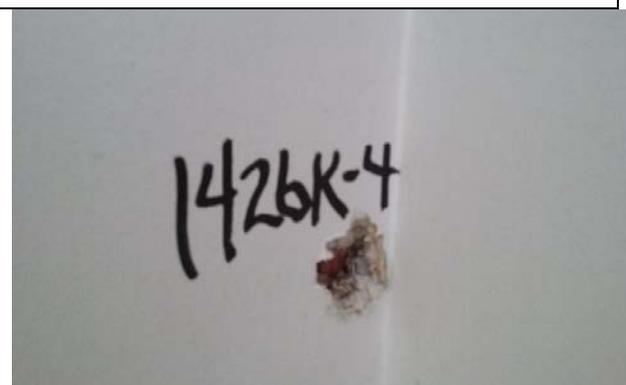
Drywall/J.C. (1426K-4) Bedroom 2, Wall C.
